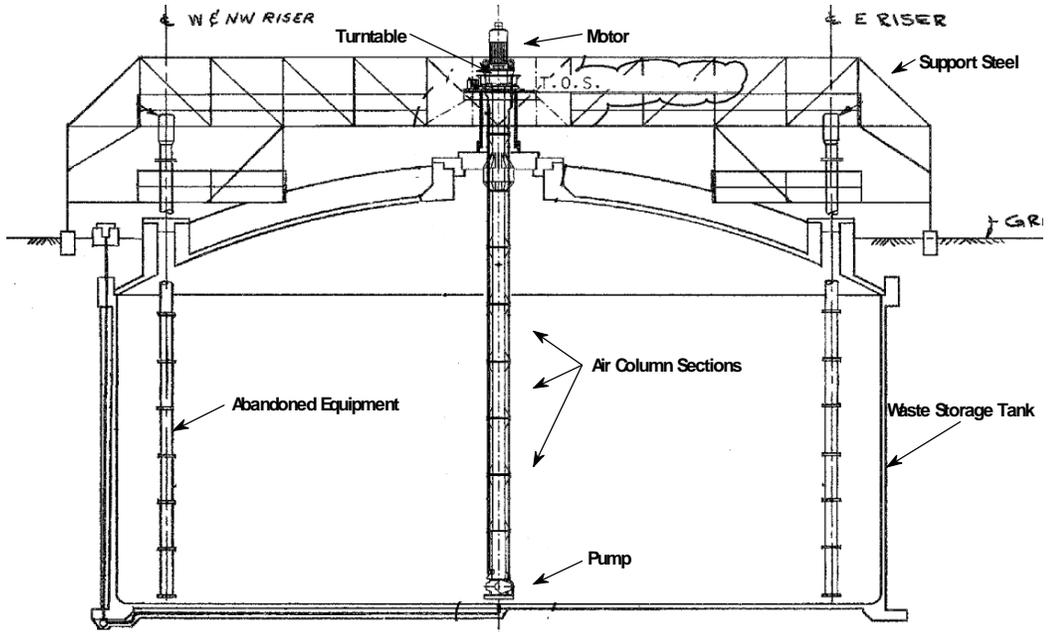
Elevation View of Waste Storage Tank with ADMP Installed in Center Riser
